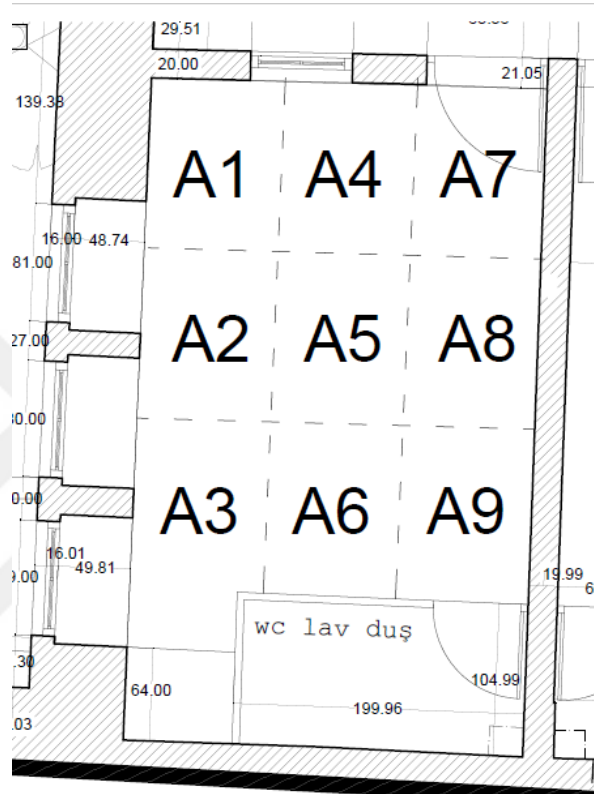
G7 Room plan (TEMA 2008, Organized by Author)
